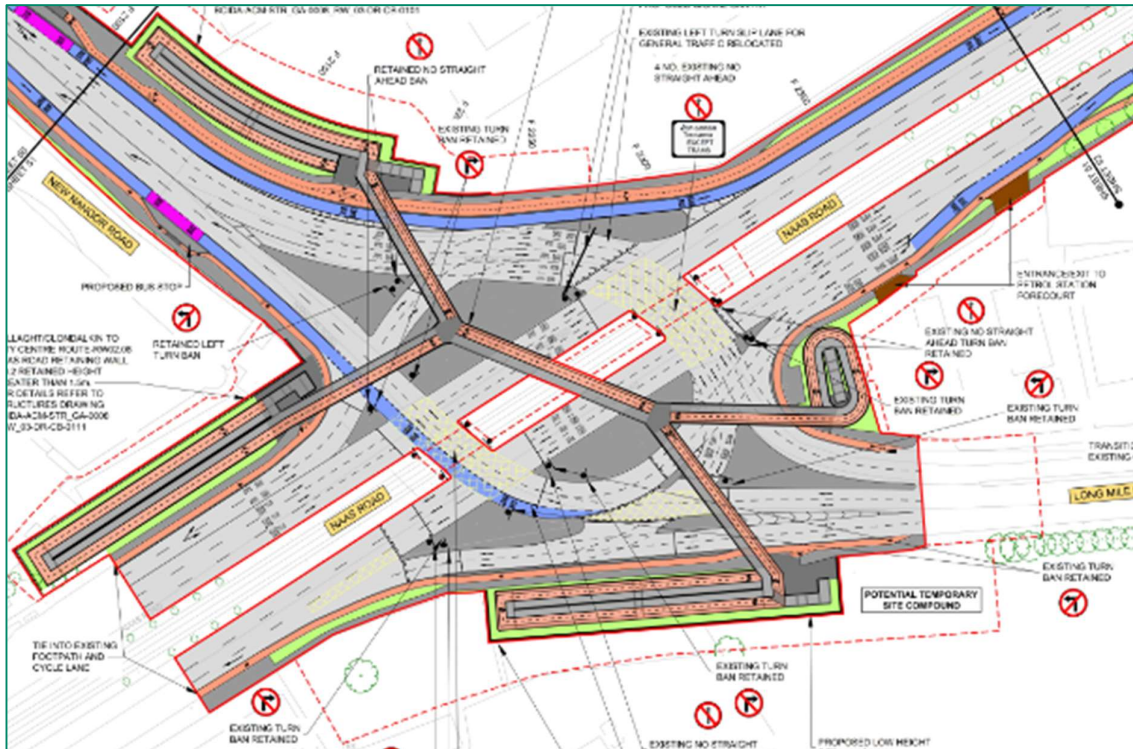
Extract from General Arrangement Drawings at New Nangor Road / Naas Road / Long Mile Road junction (Sheet 51)
